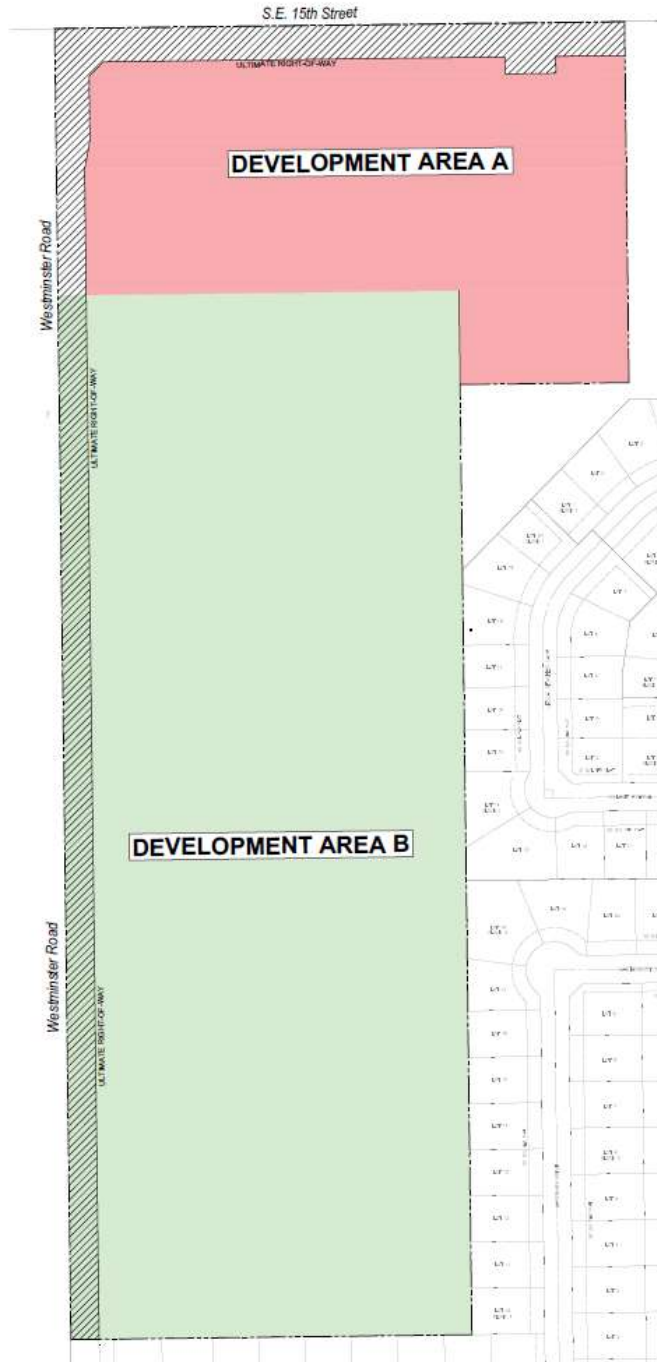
EXHIBIT G - CONCEPTUAL SITE PLAN (Development Area 'B')
